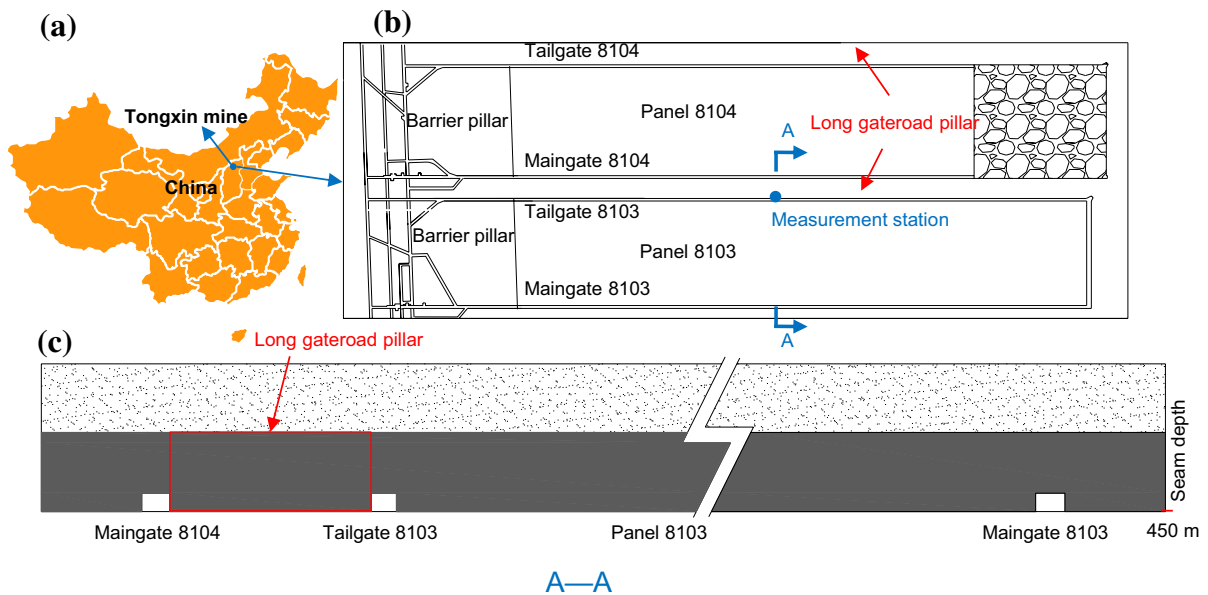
Tongxin coal mine including: a the location of mine, b plan view of panels 8103 and 8104 and c cross-section of roadways layout
